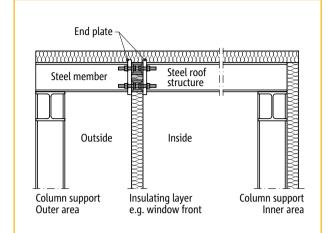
Schöck Isokorb® type S22 for separation within the structural system
